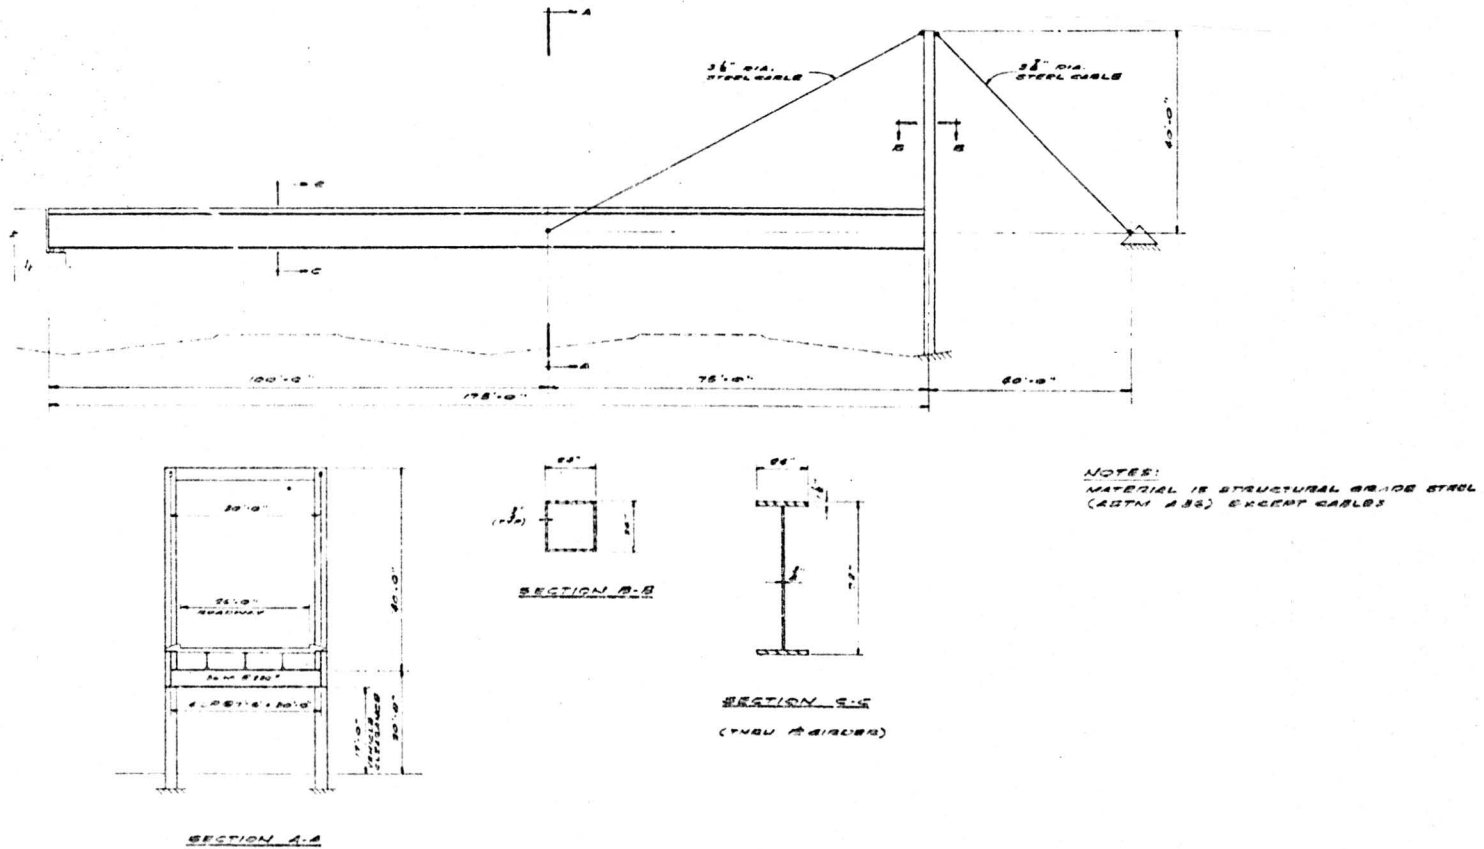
PRELIMINARY DESIGN DRAWING OF BRIDLE BRIDGE
